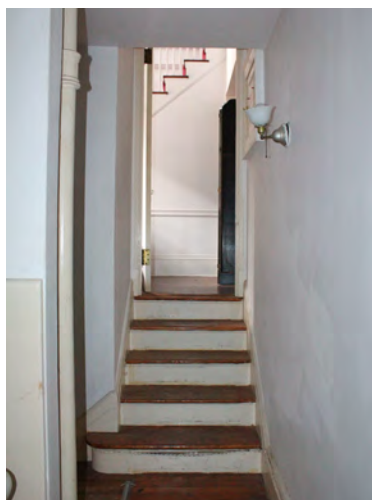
Servant's Stair (217) in second floor corridor. (HA, 2015)
